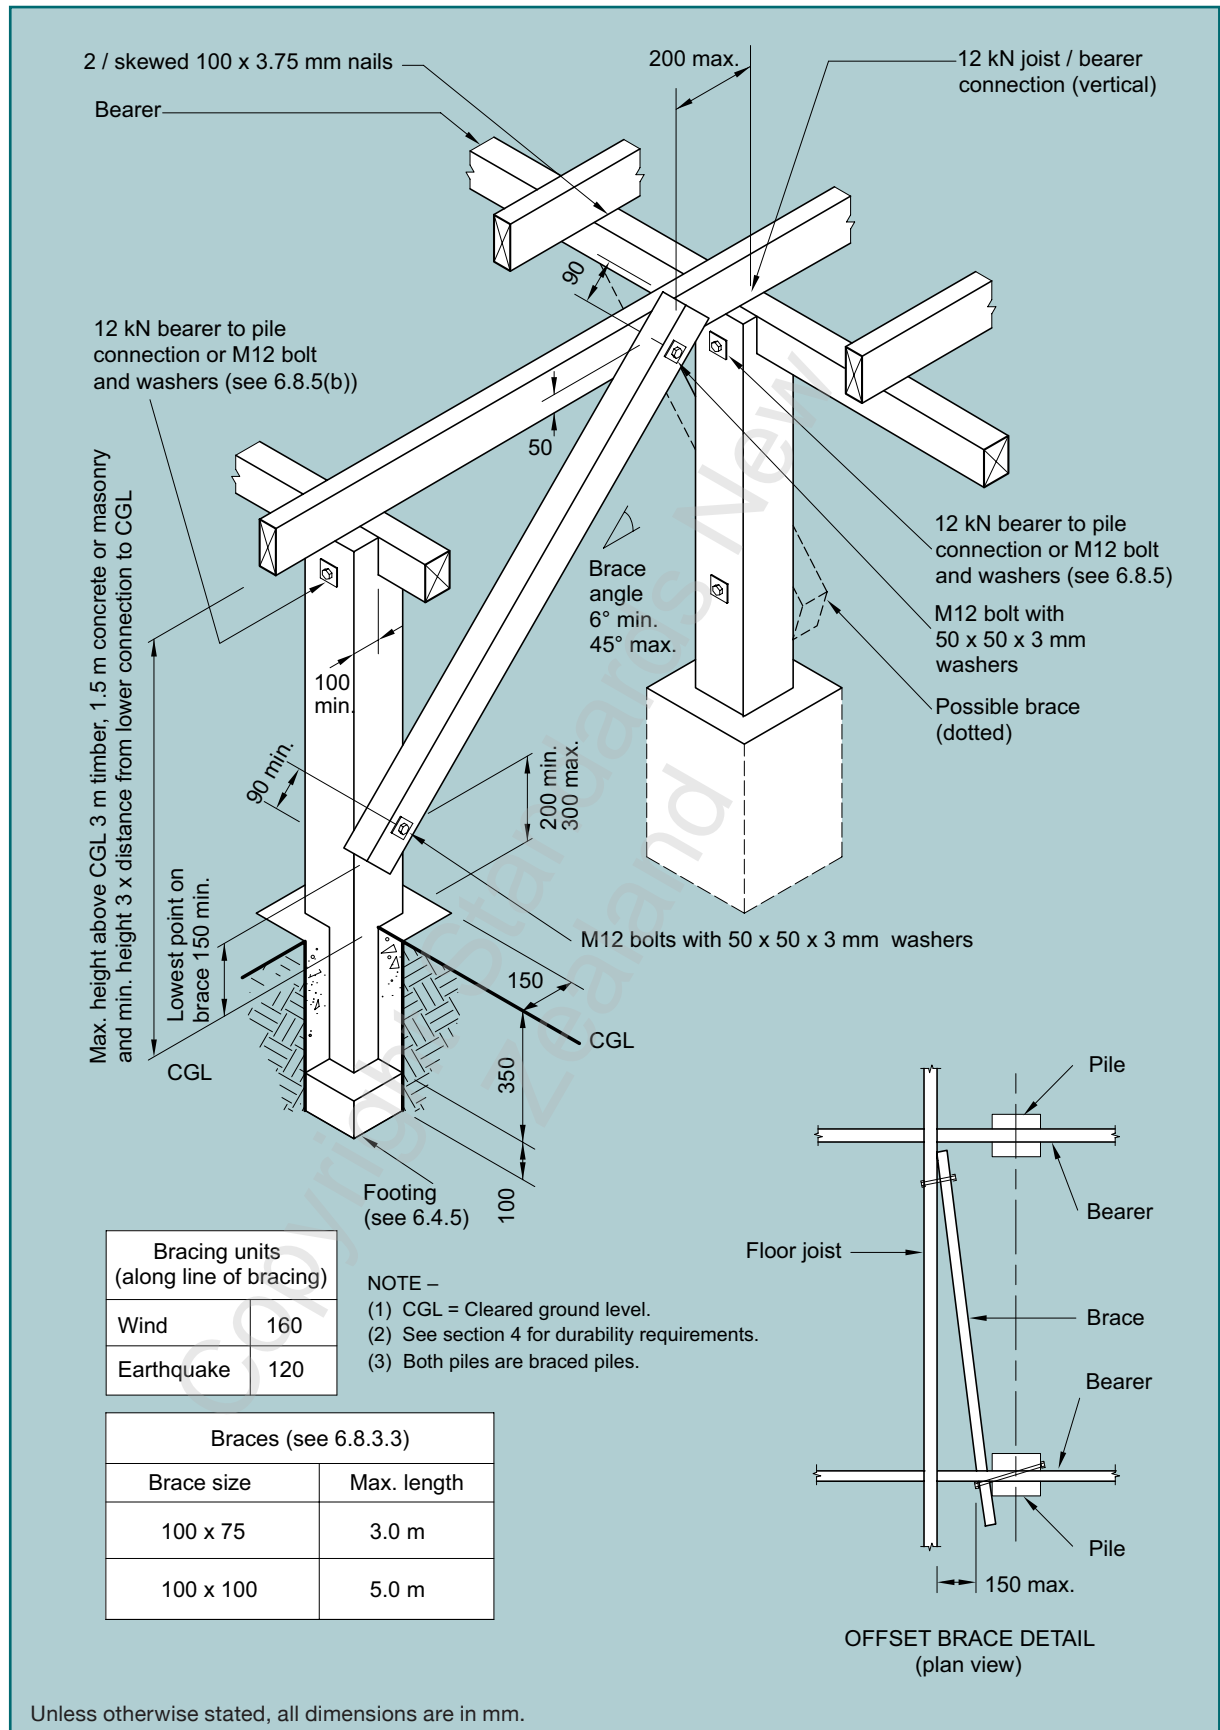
Braced pile system – Brace connected to joist (see 6.8)
